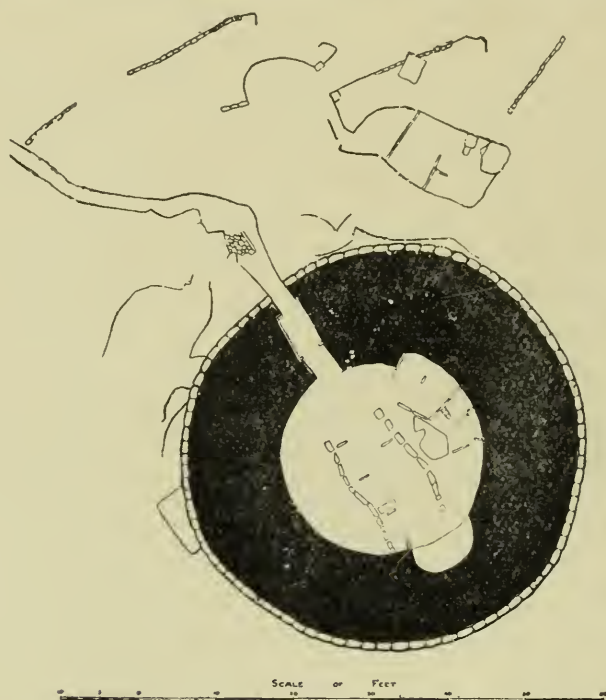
"Broch at the White Gate," Keiss (No. 516); Ground-plan.
